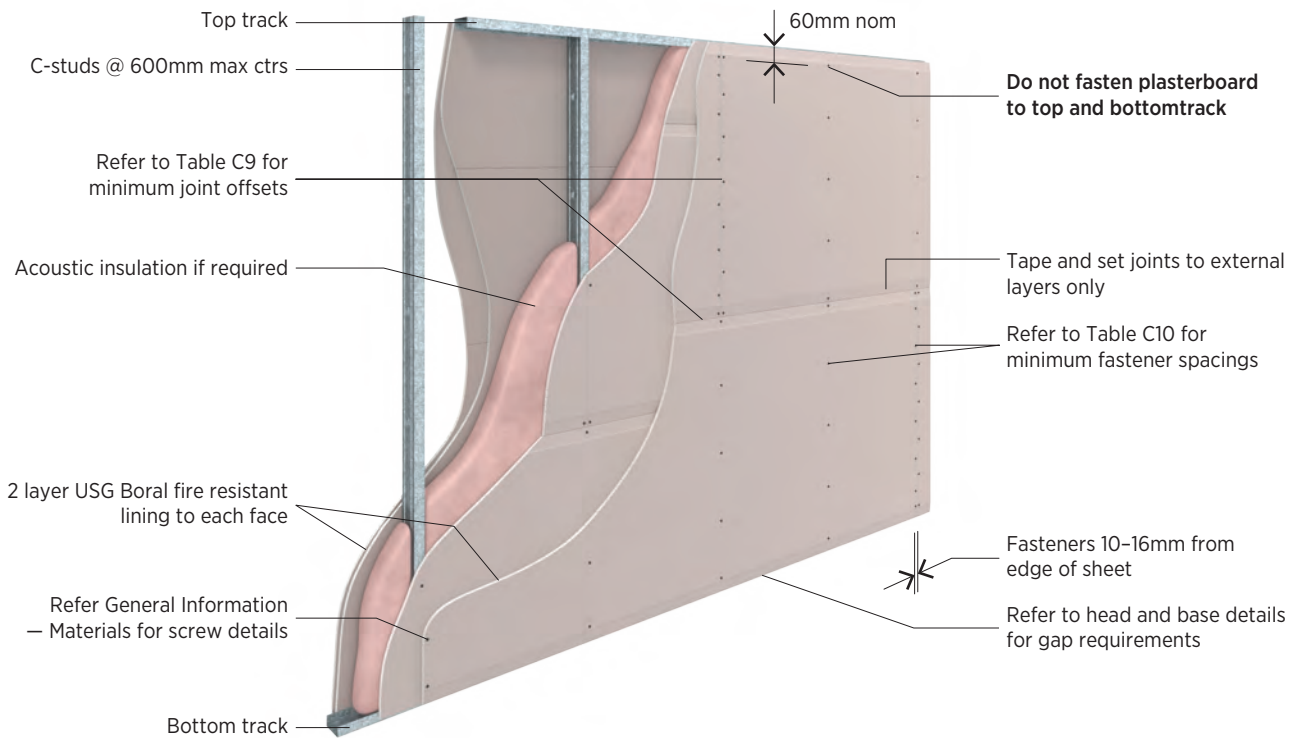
Fire Rated Steel Stud - Horizontal Fixing - Multiple Layer
